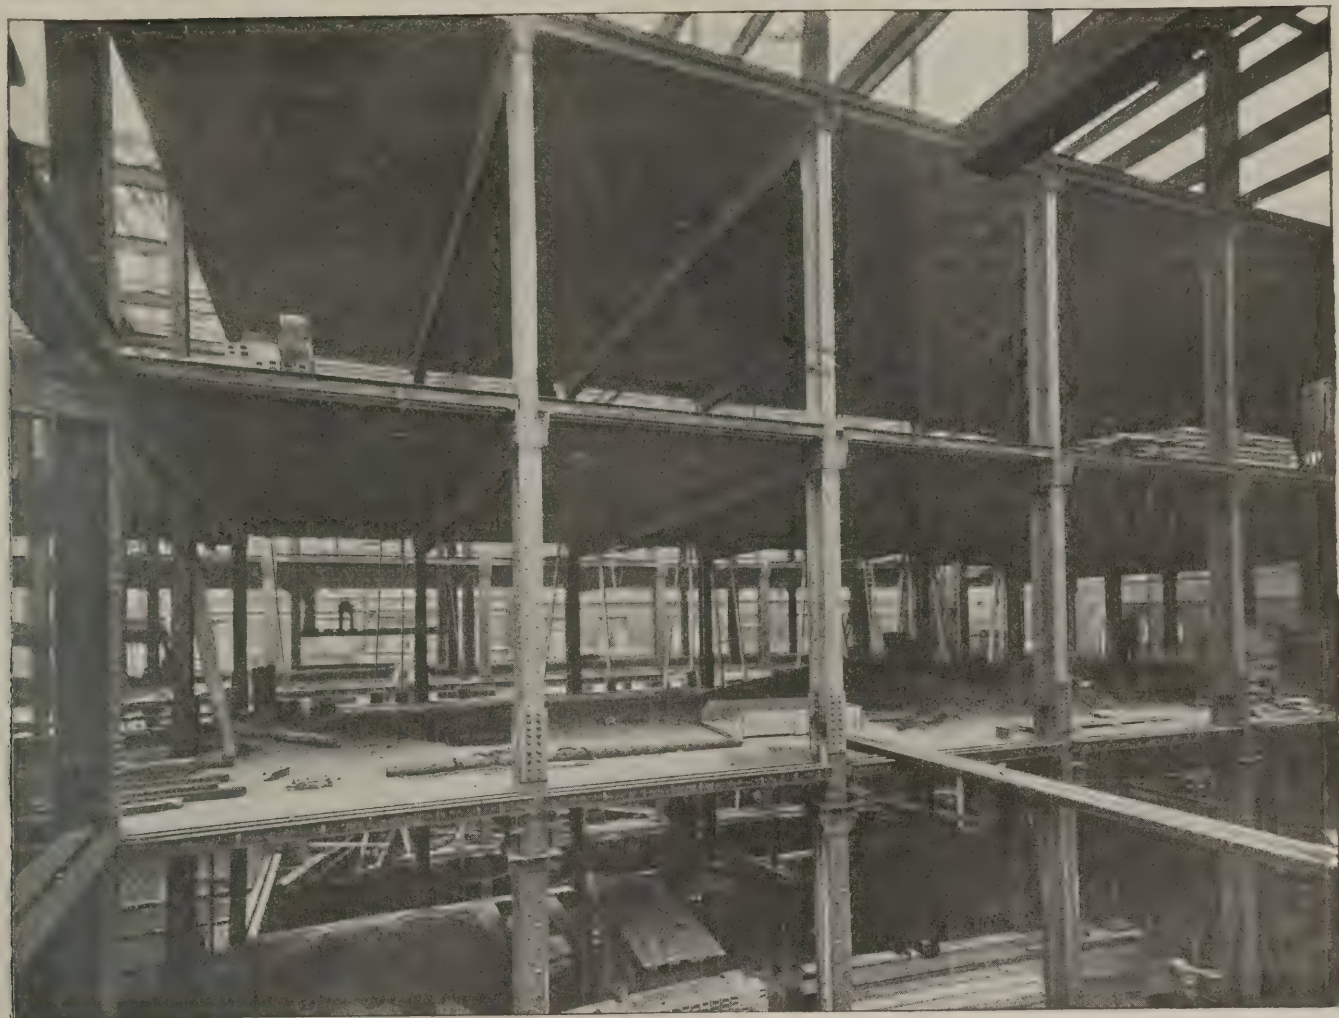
KLEINE FLOORS AT THE WESTMINSTER TRUST BUILDING.
